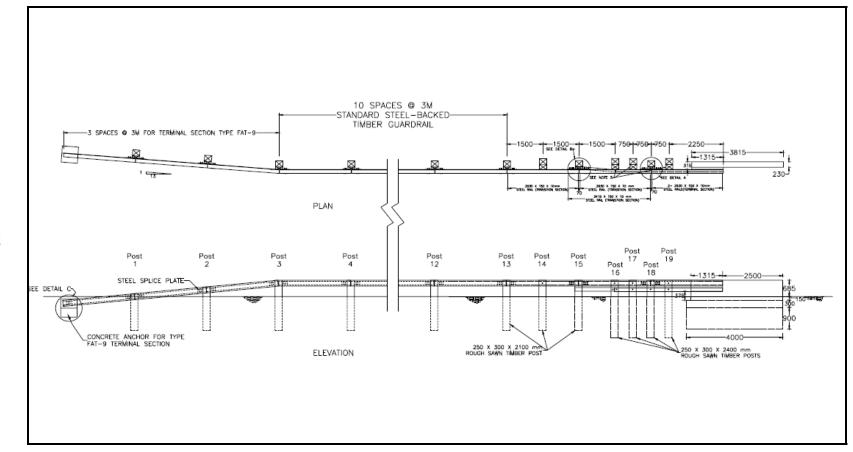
Layout of Type A Steel-Backed Timber Guardrail
